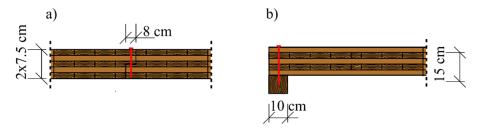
(a) Detail of the half-lap joint, (b) Panel-to-beam connection.
